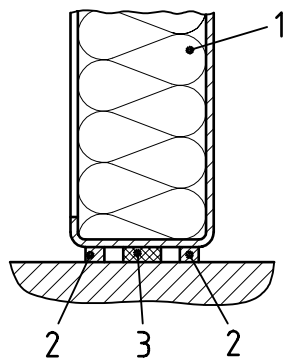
Example of vertical connection of enclosure wall elements
